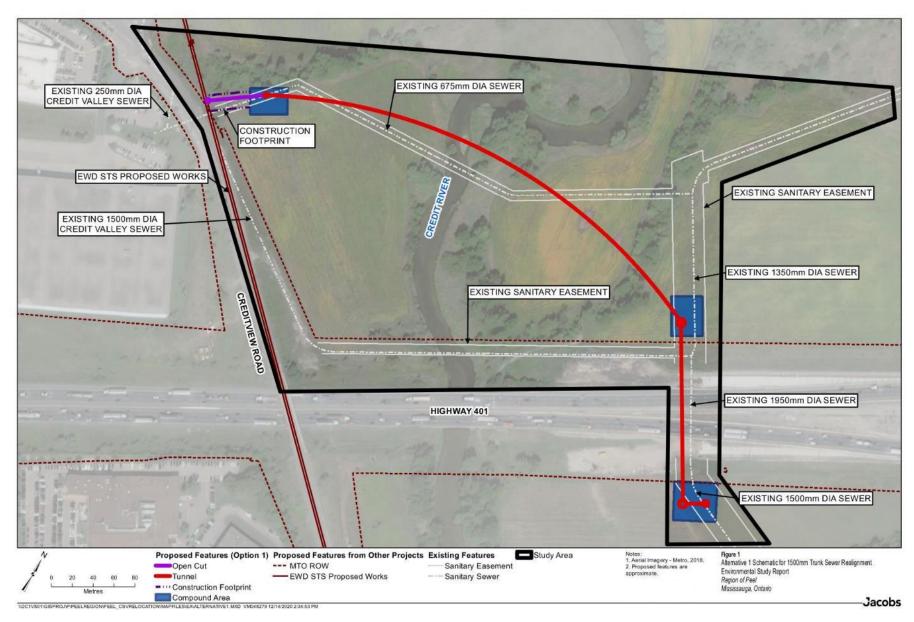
Alternative No. 1: 70 m Open-Cut and 640 m Tunnel
